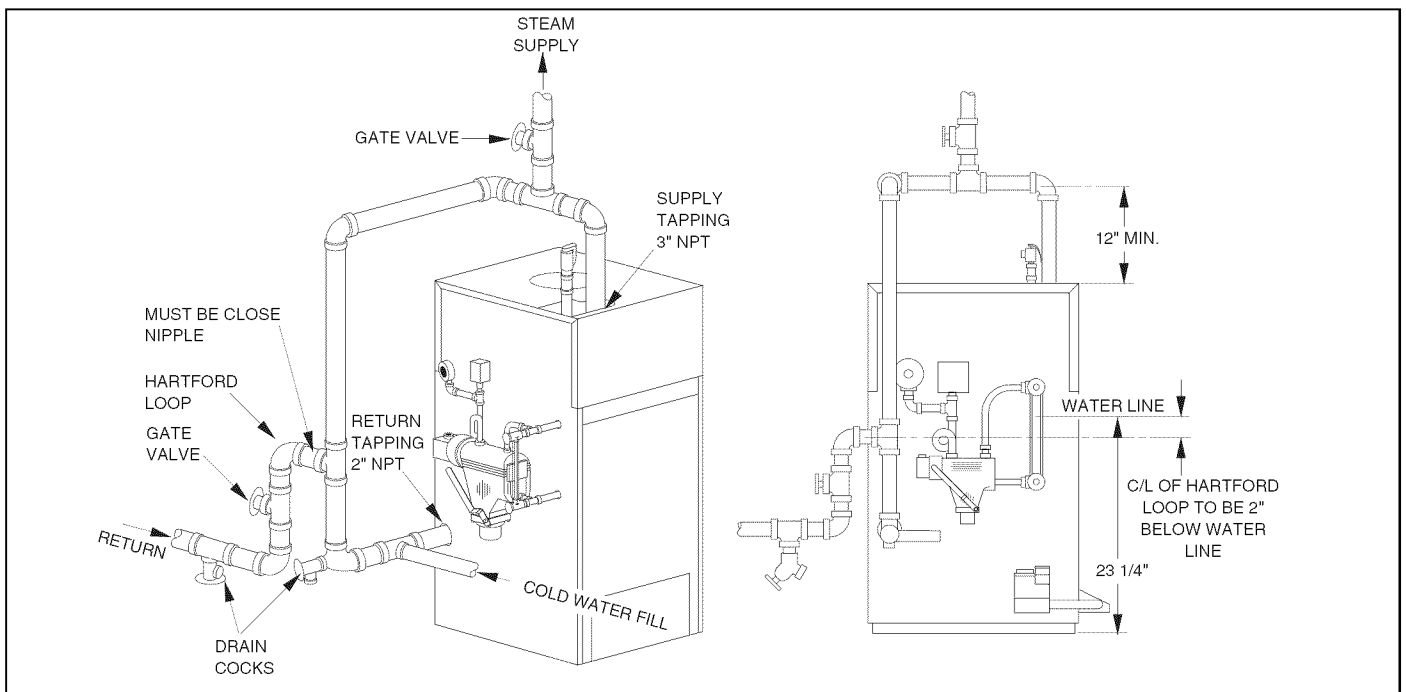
TYPICAL STEAM BOILER PIPING
